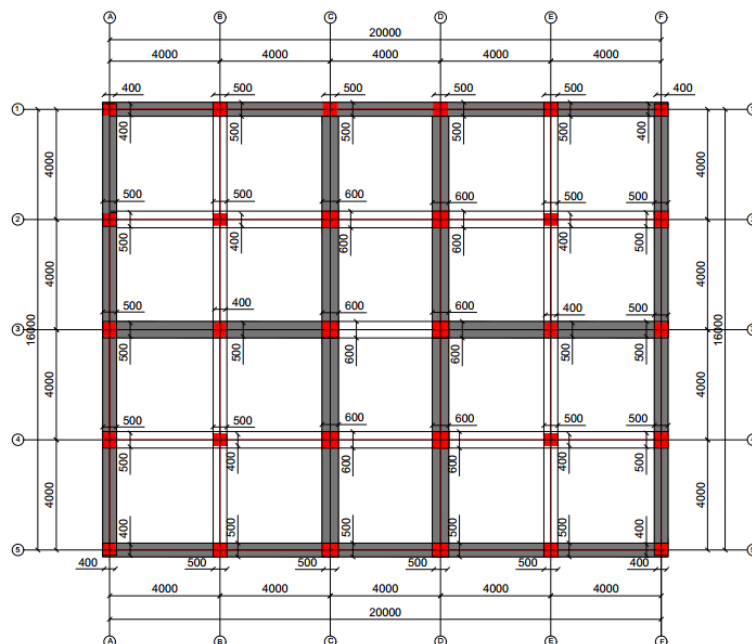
Structural plan view of the 6-story frame (units in mm).
